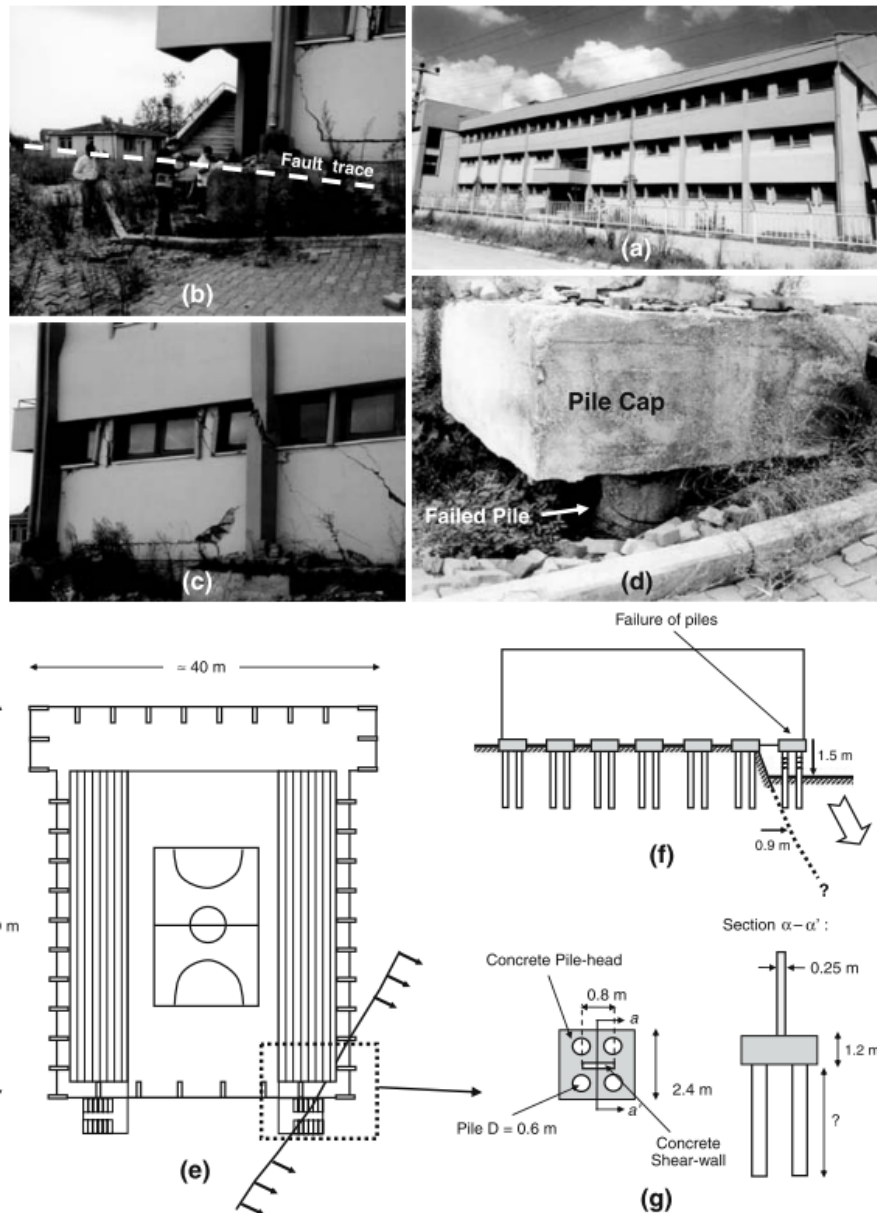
"Attaturk" basketball court severe damages, photos and schematic plan view and cross sections, (Anastasopoulos and Gazetas [2007a]).
